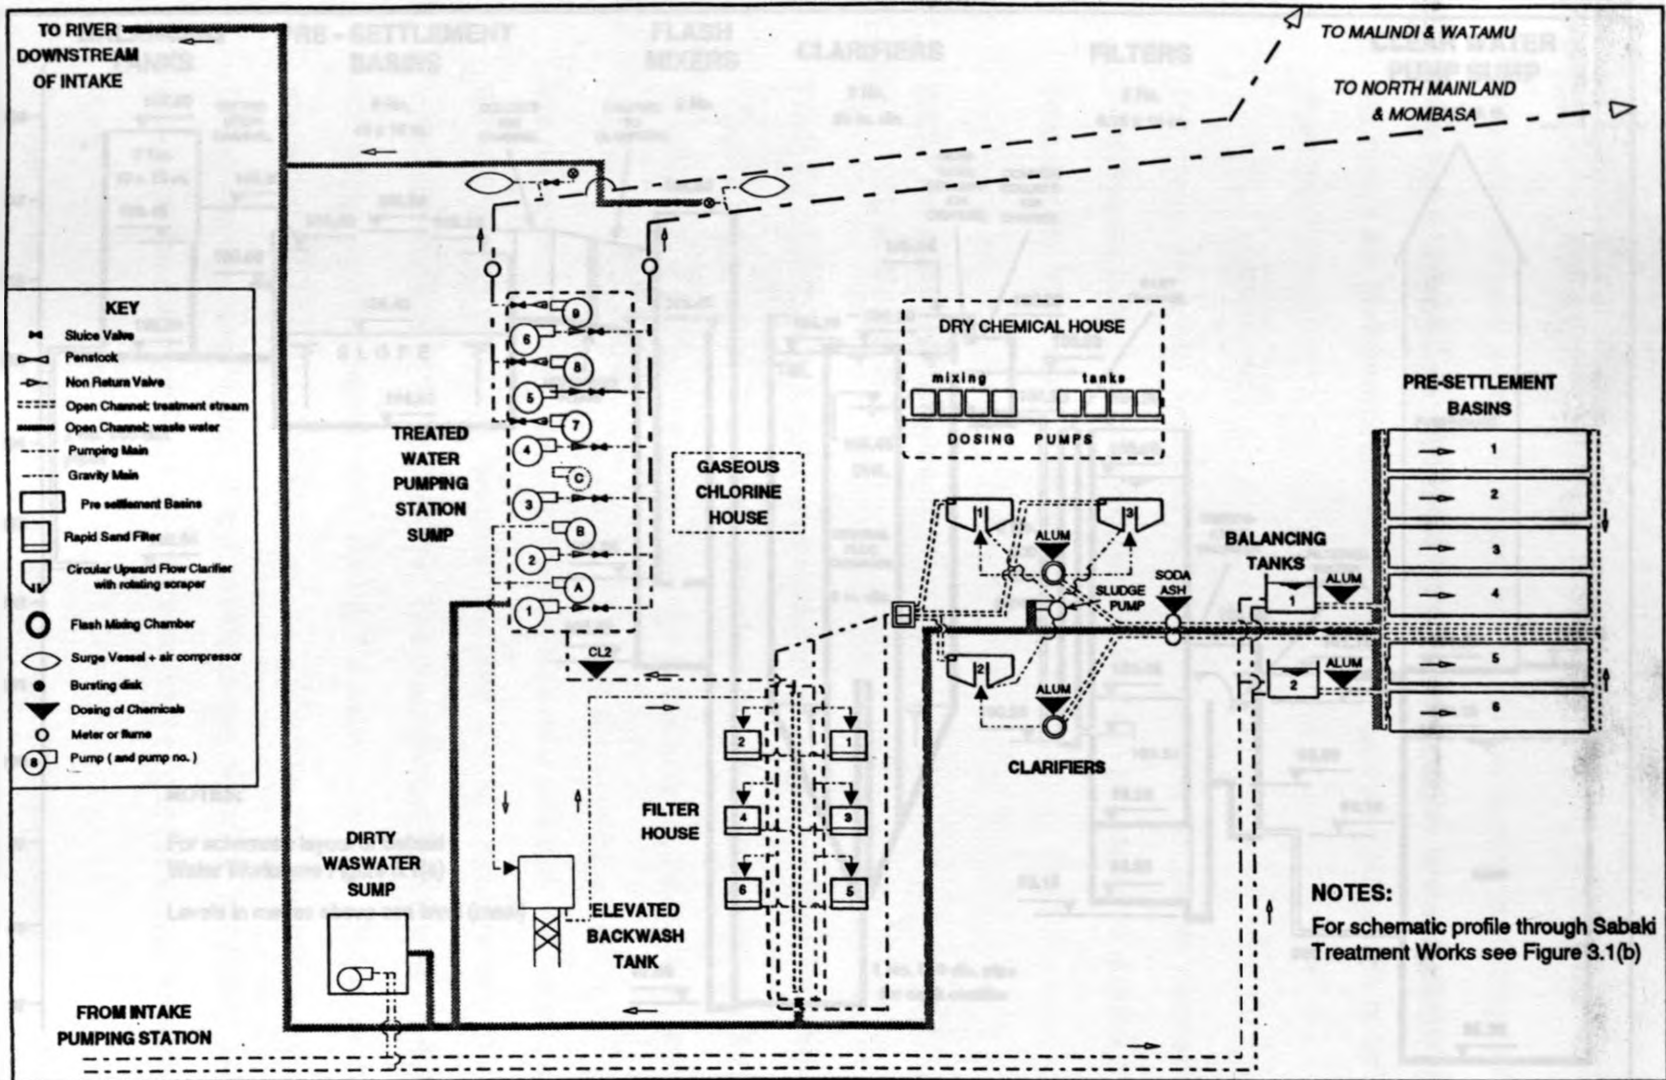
(a) SCHEMATIC LAYOUT OF SABAHI WATER WORKS NOT TO SCALE
